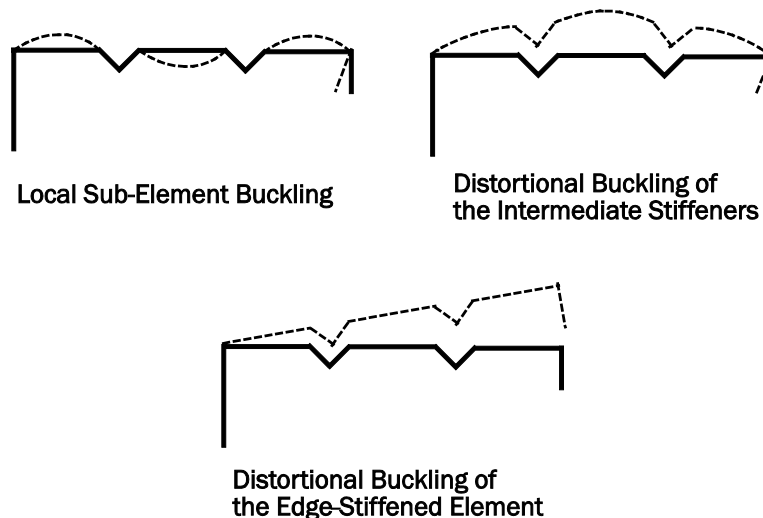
Buckling Modes in an Edge-Stiffened Element With Intermediate Stiffeners
